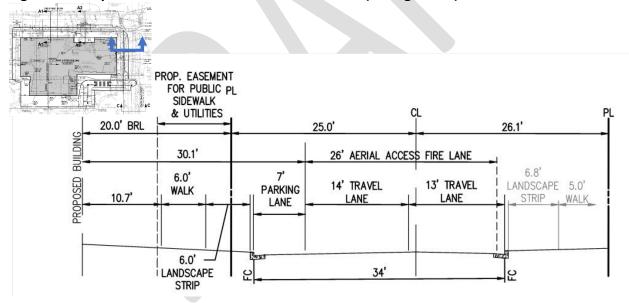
Proposed South Grant Street Cross Section (Facing North)
